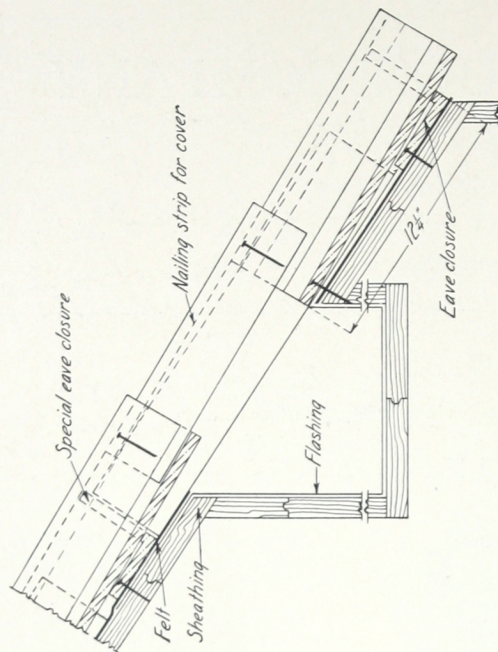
# DETAILS OF IMPERIAL STRAIGHT BARREL MISSION TILES AND FITTINGS
